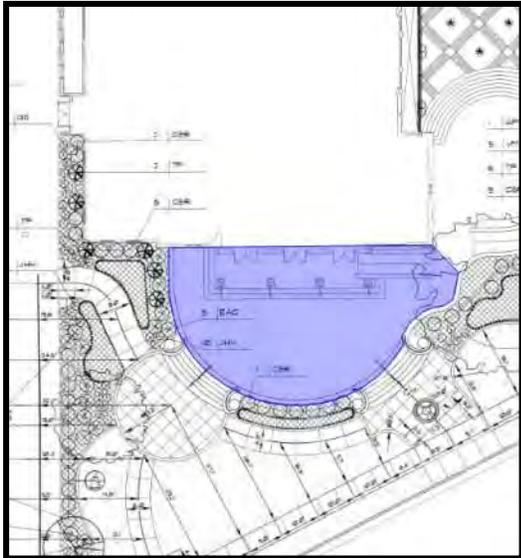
Plan view of the south exterior highlighting the location of the concrete slab-on-grade.
